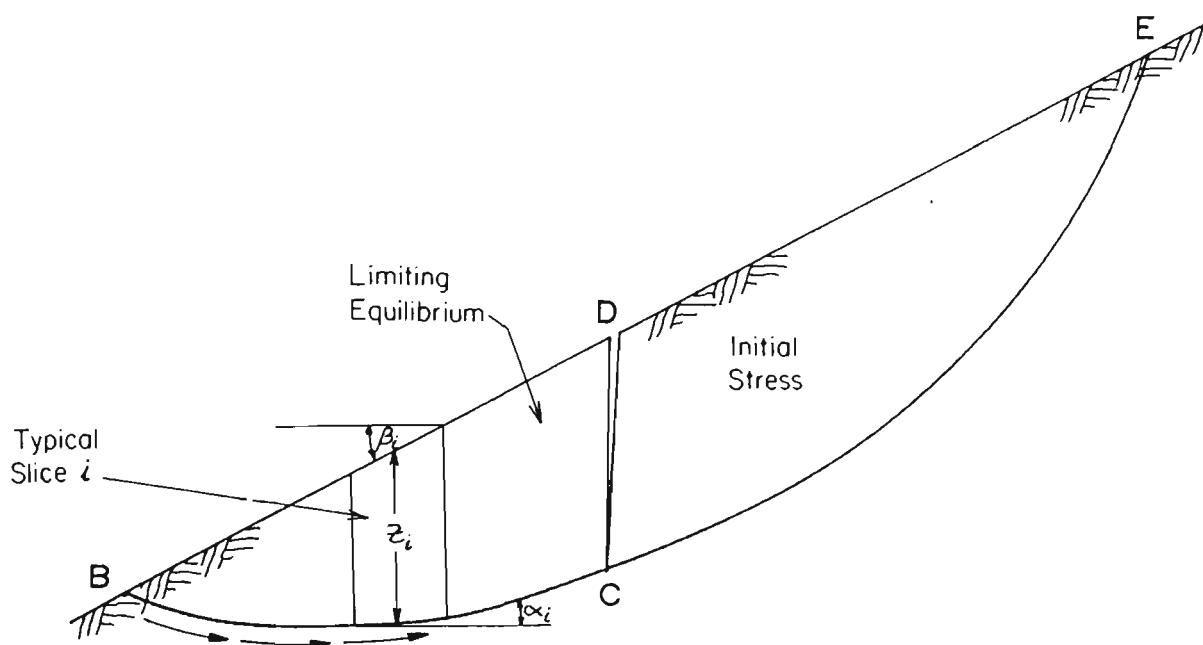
Slope Cross-section during Progression of Failure using Tension Crack Approach.
